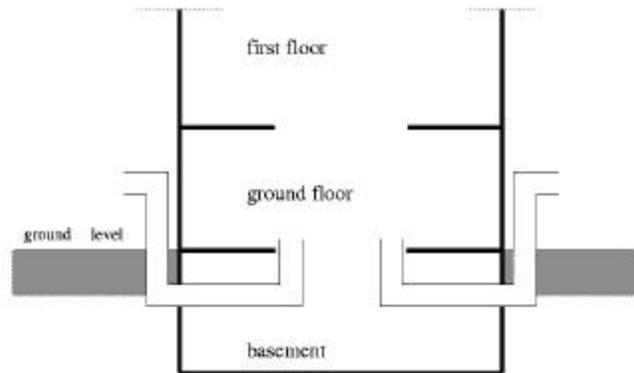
Sketch of natural ventilation ducts providing outdoor air to the core of the atrium
